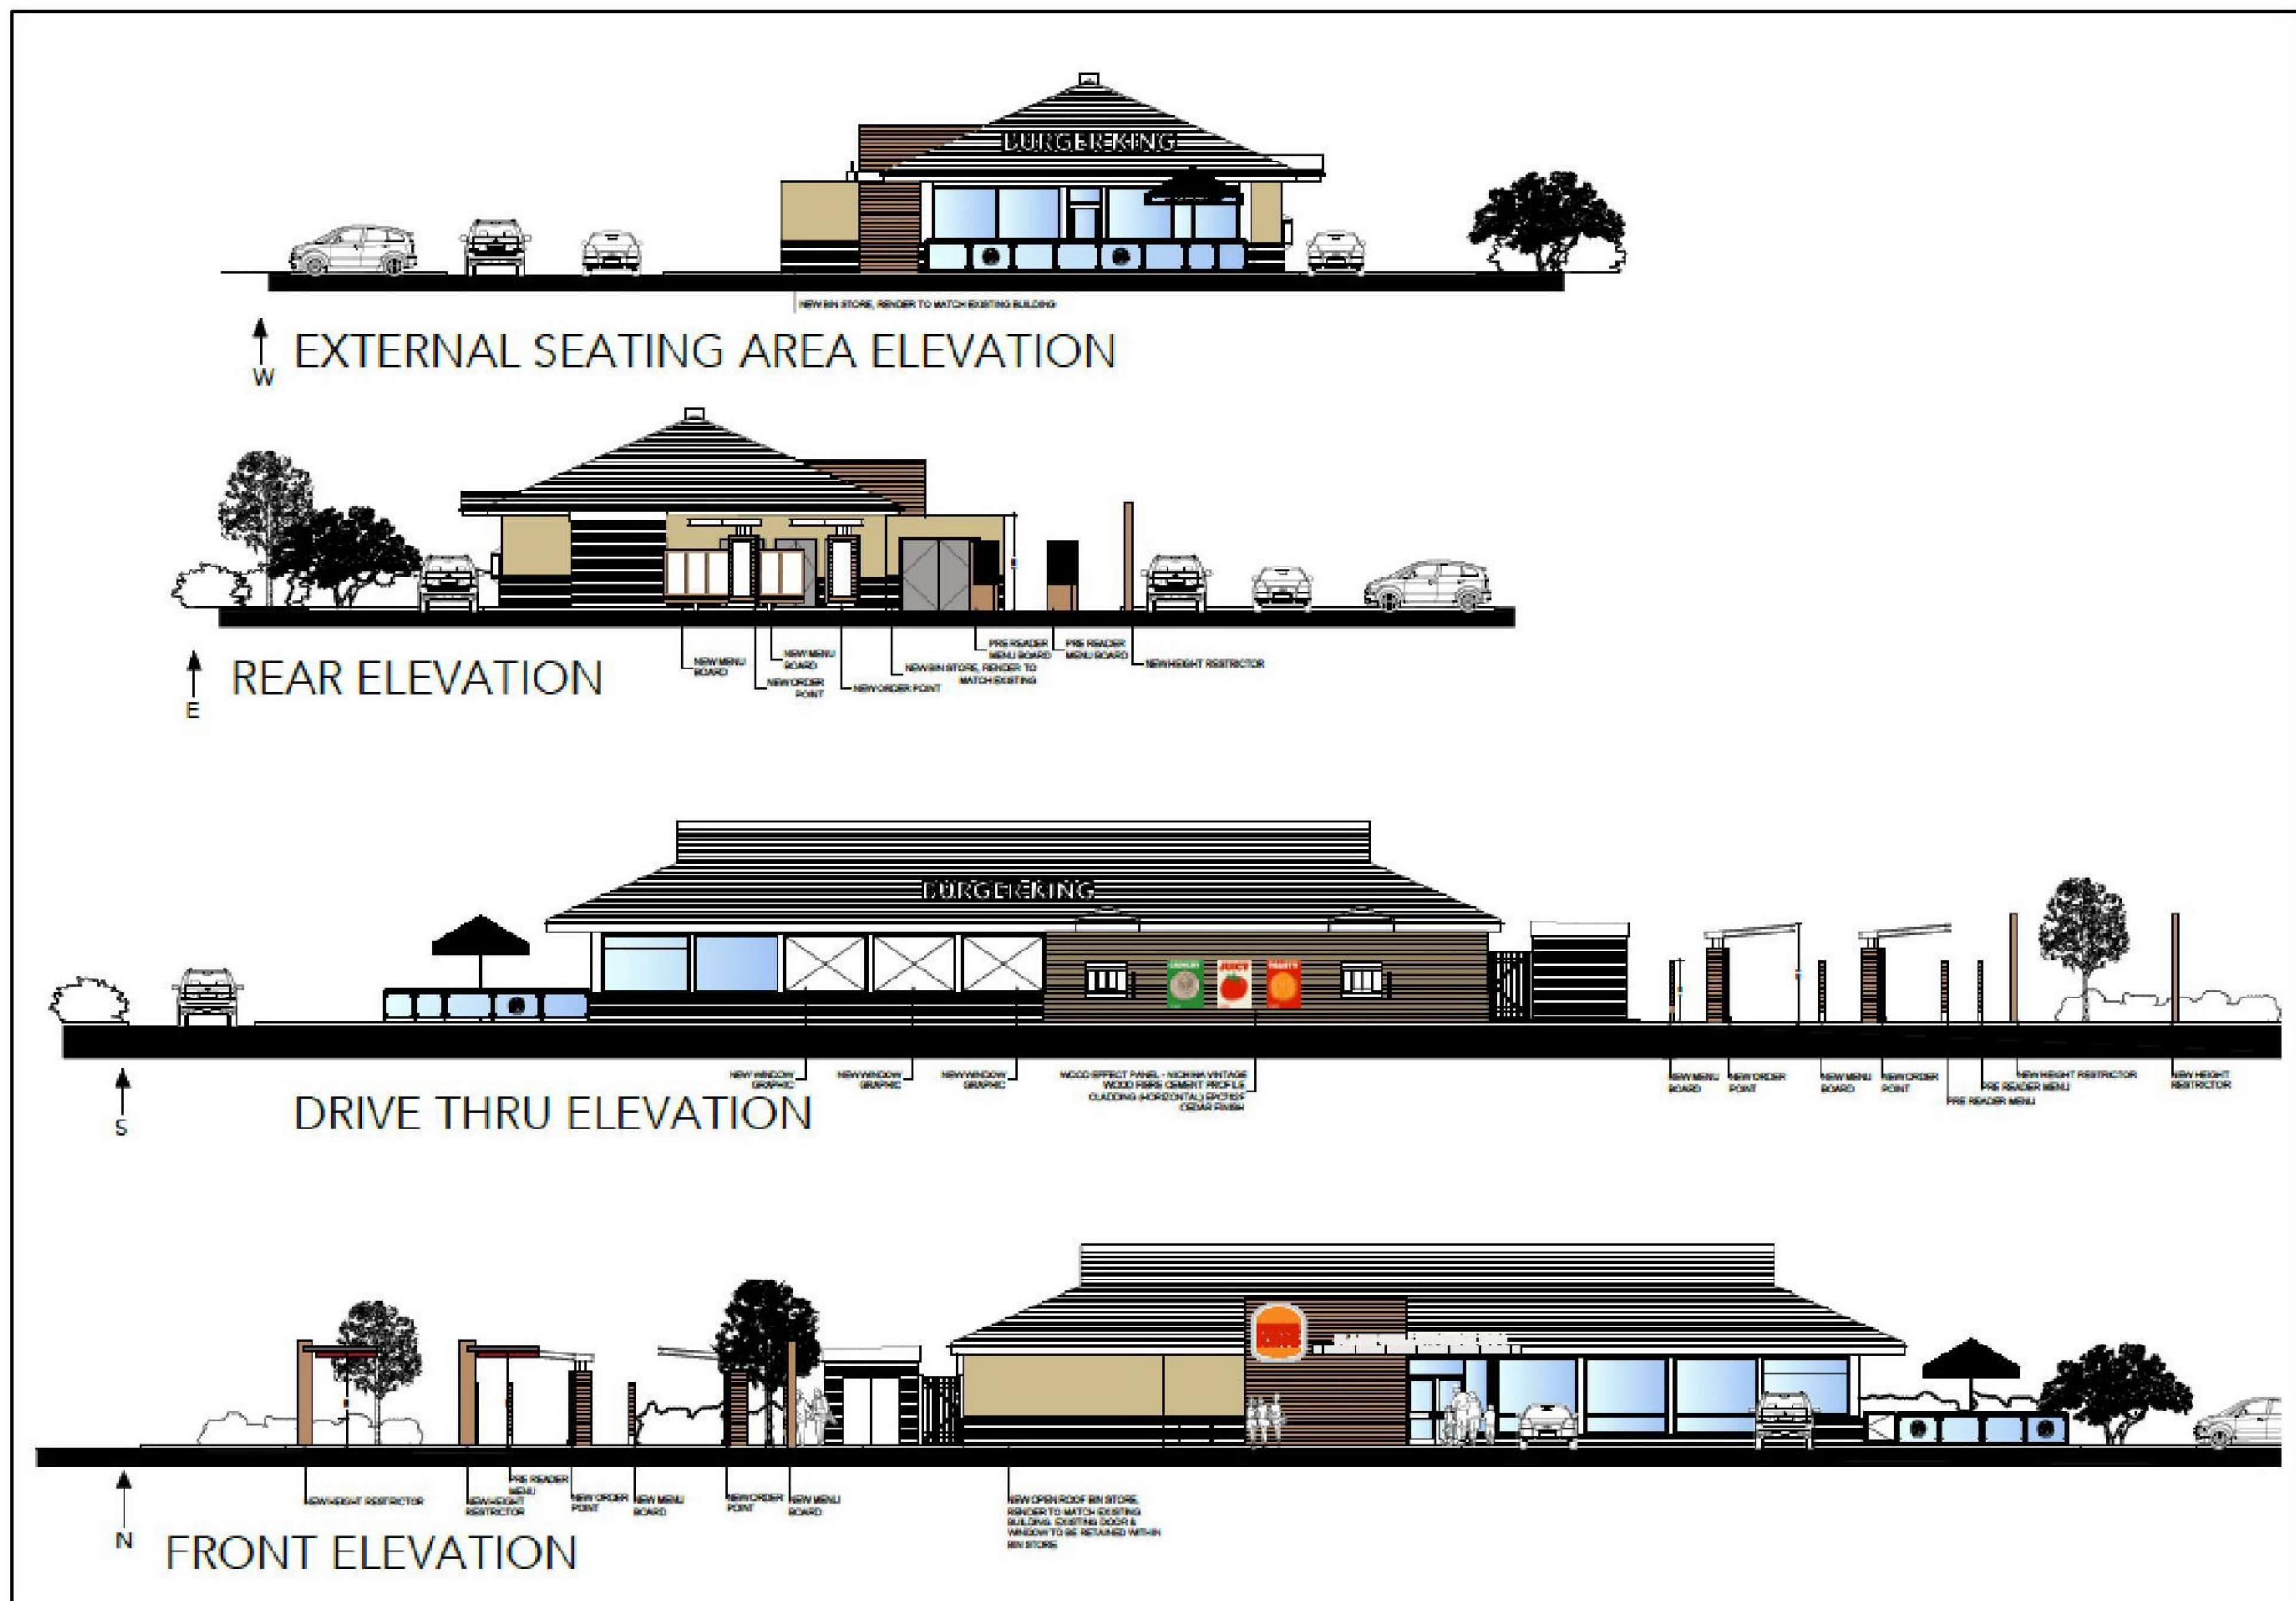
Extract of Proposed Elevations illustrating external refurbishment works.
